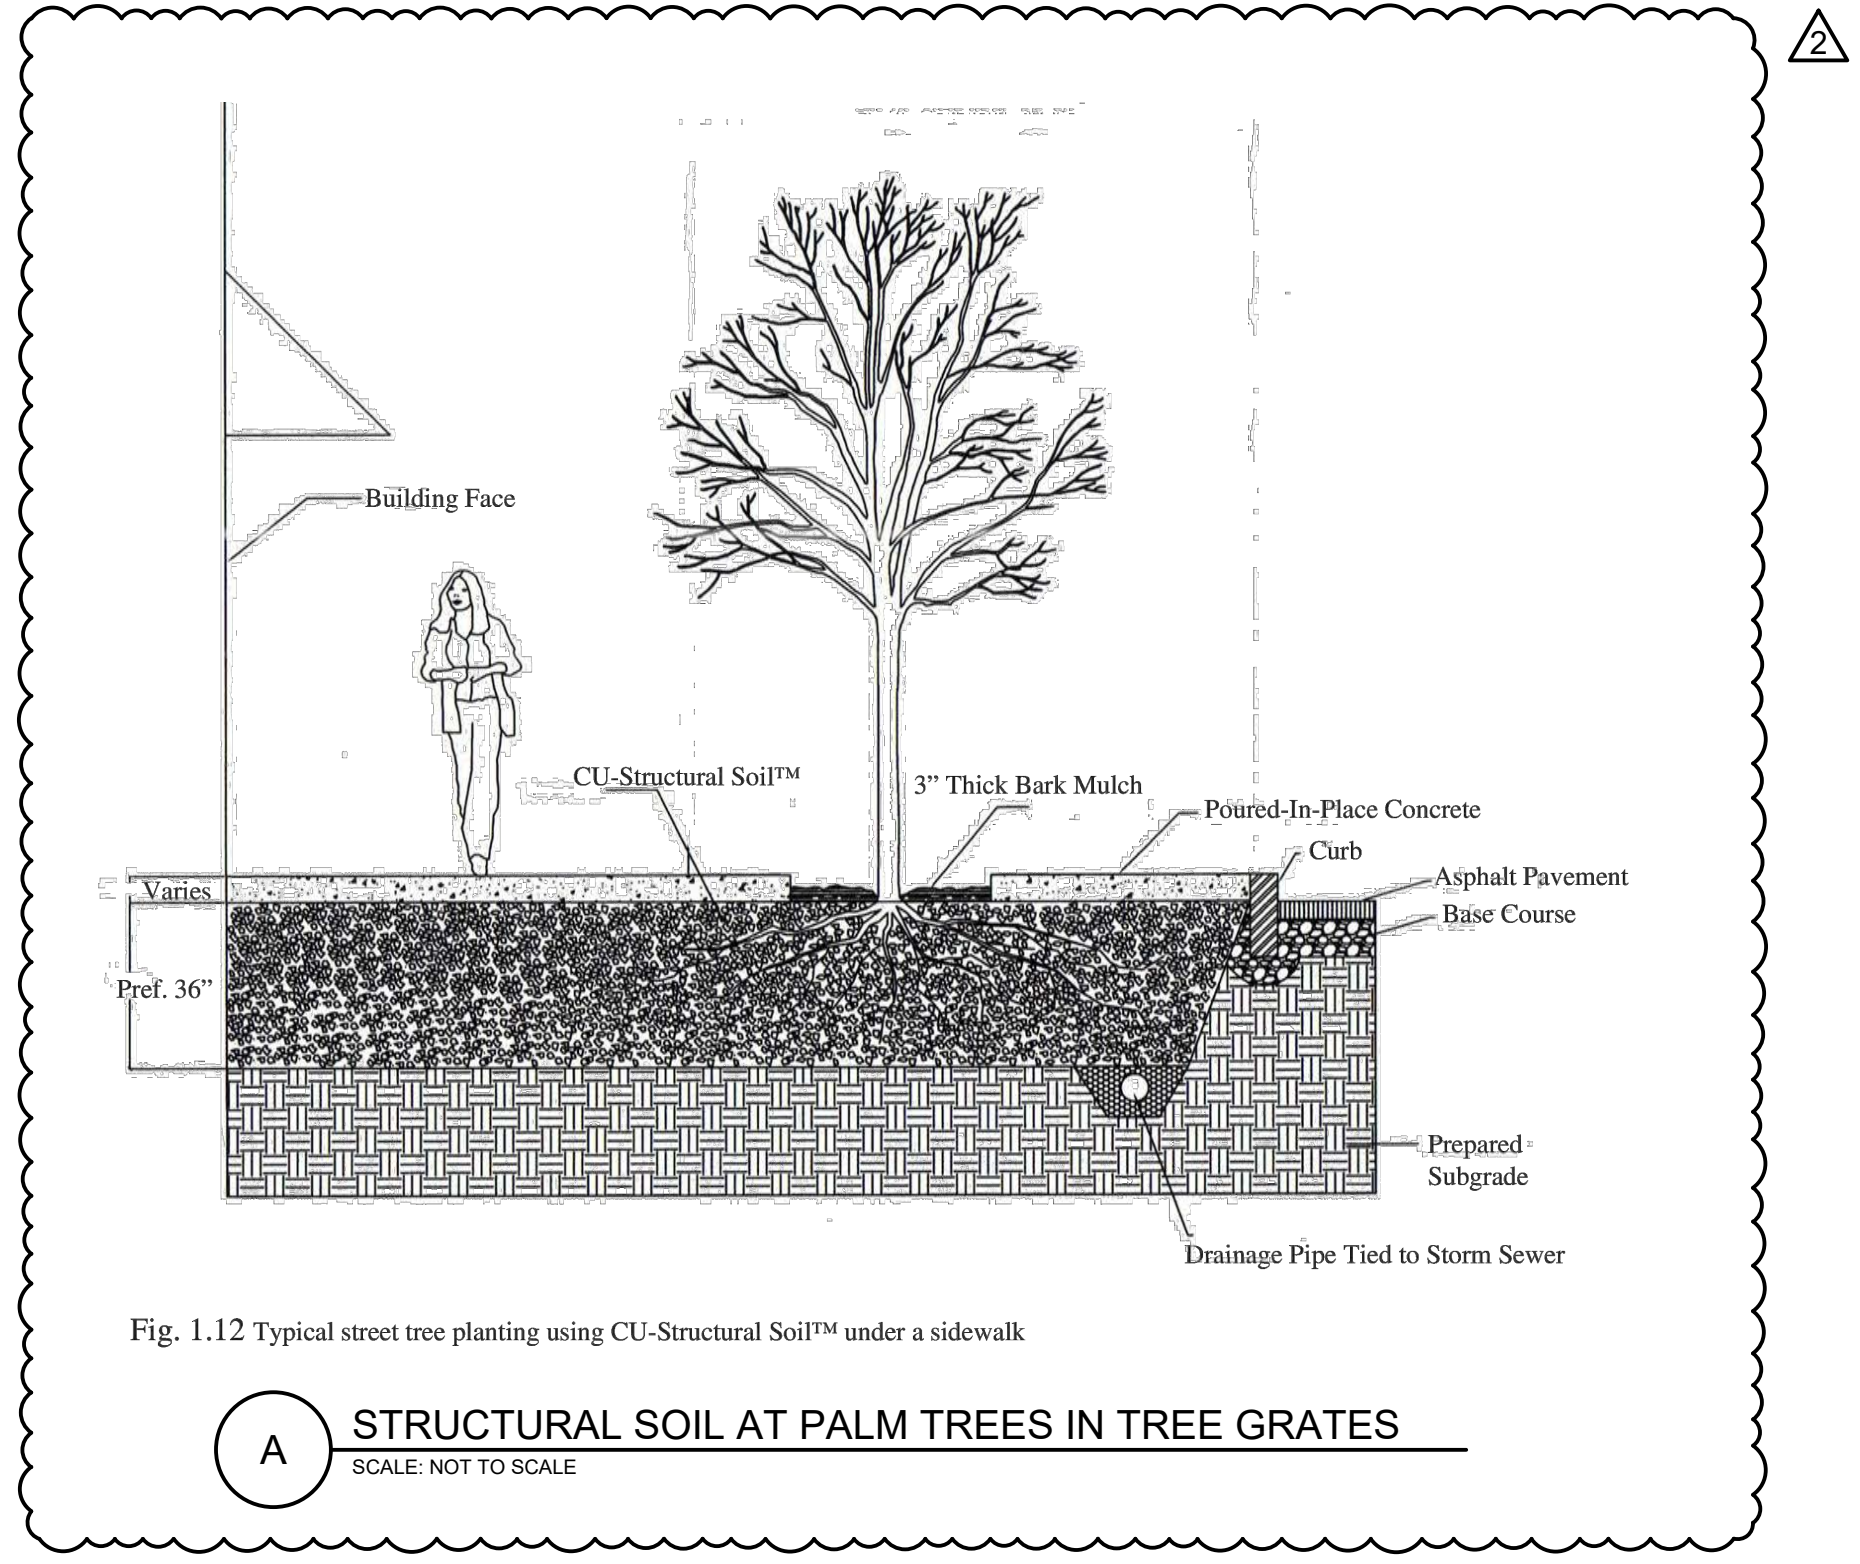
Typical street tree planting using CU-Structural Soil™ under a sidewalk
